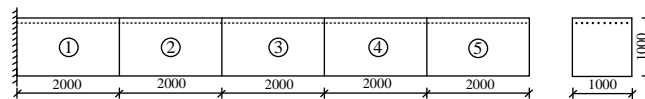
Dimensions and tendon layout of beam III (Unit: mm)
